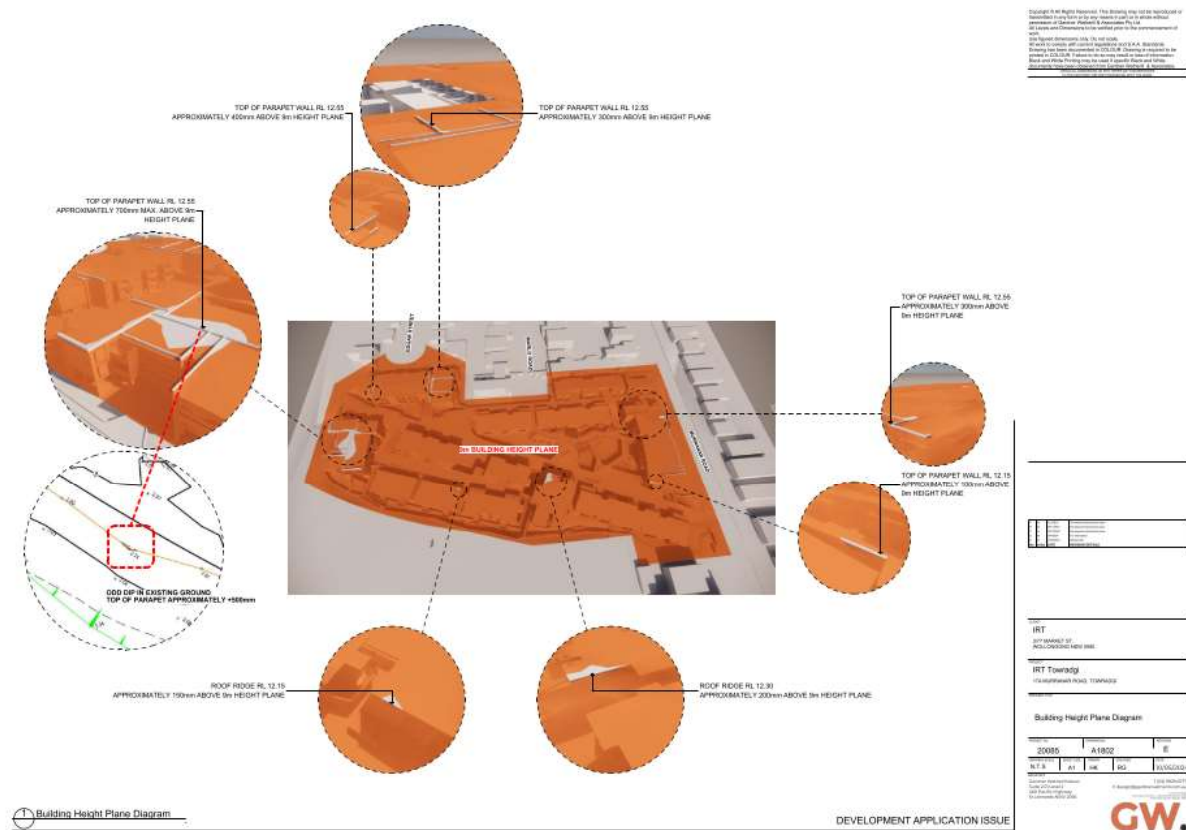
BUILDING HEIGHT PLANE DIAGRAM (GW ARCHITECTS)
